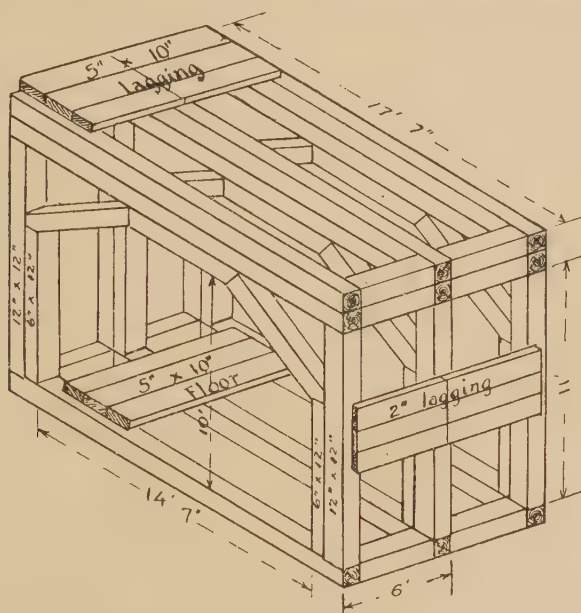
Timbering plat in heavy ground—old Butte method.
